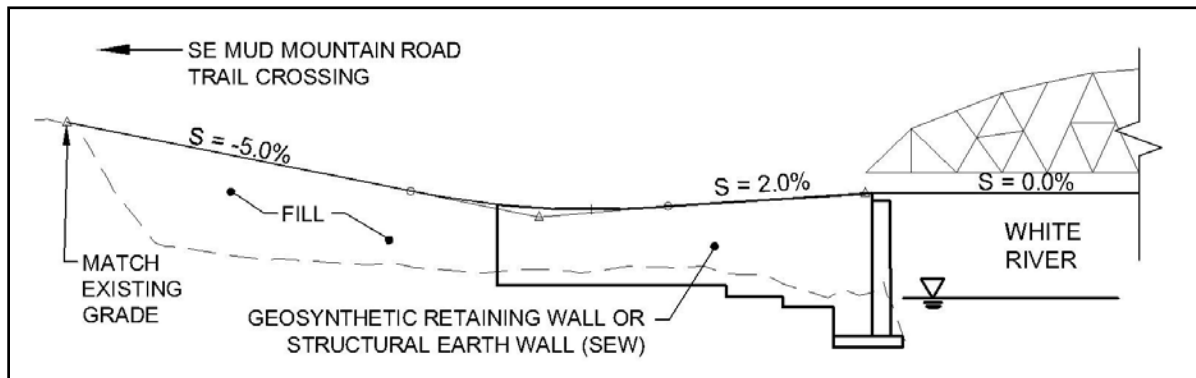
Northern White River Bridge Trail Approach – Alternative 1, Fill Slope and Walls
